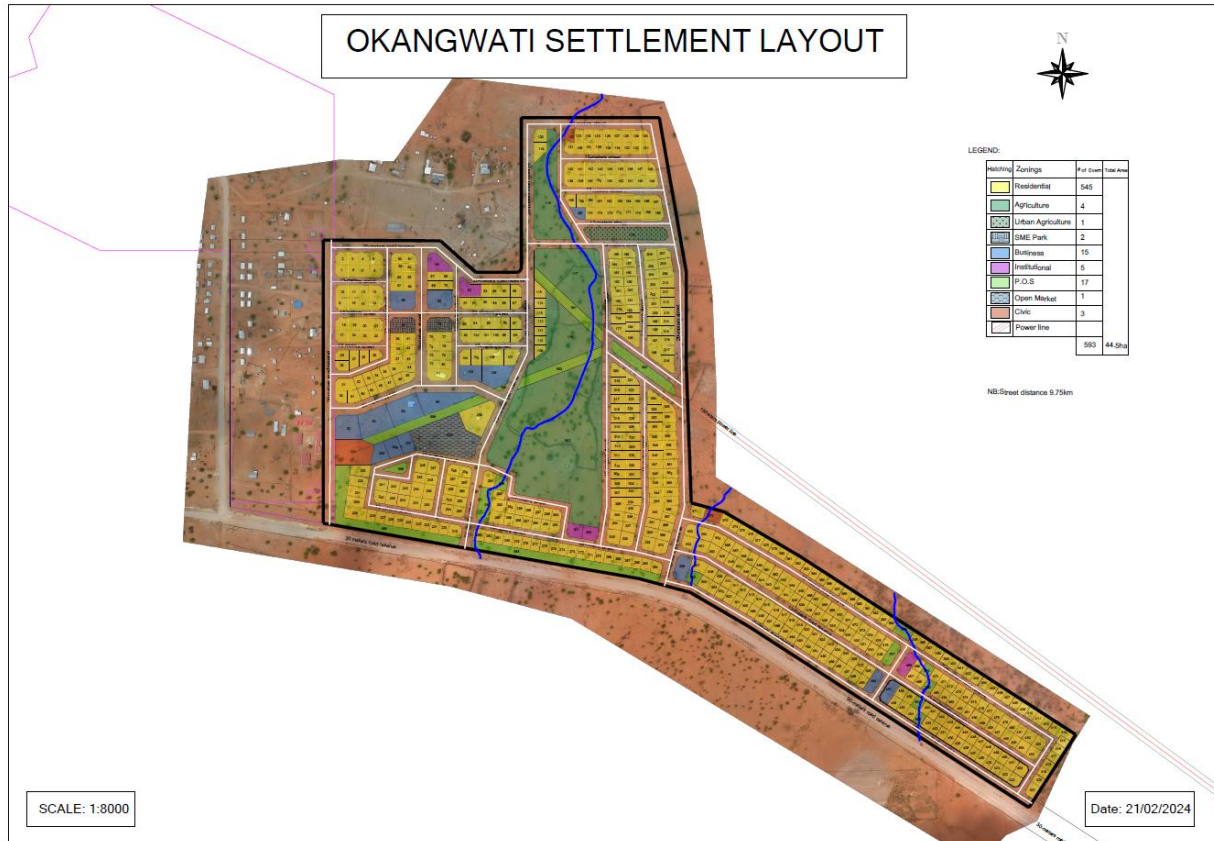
Okanguati Settlement Layout showing the proposed New Extension for which the proposed services will be installed and operated
